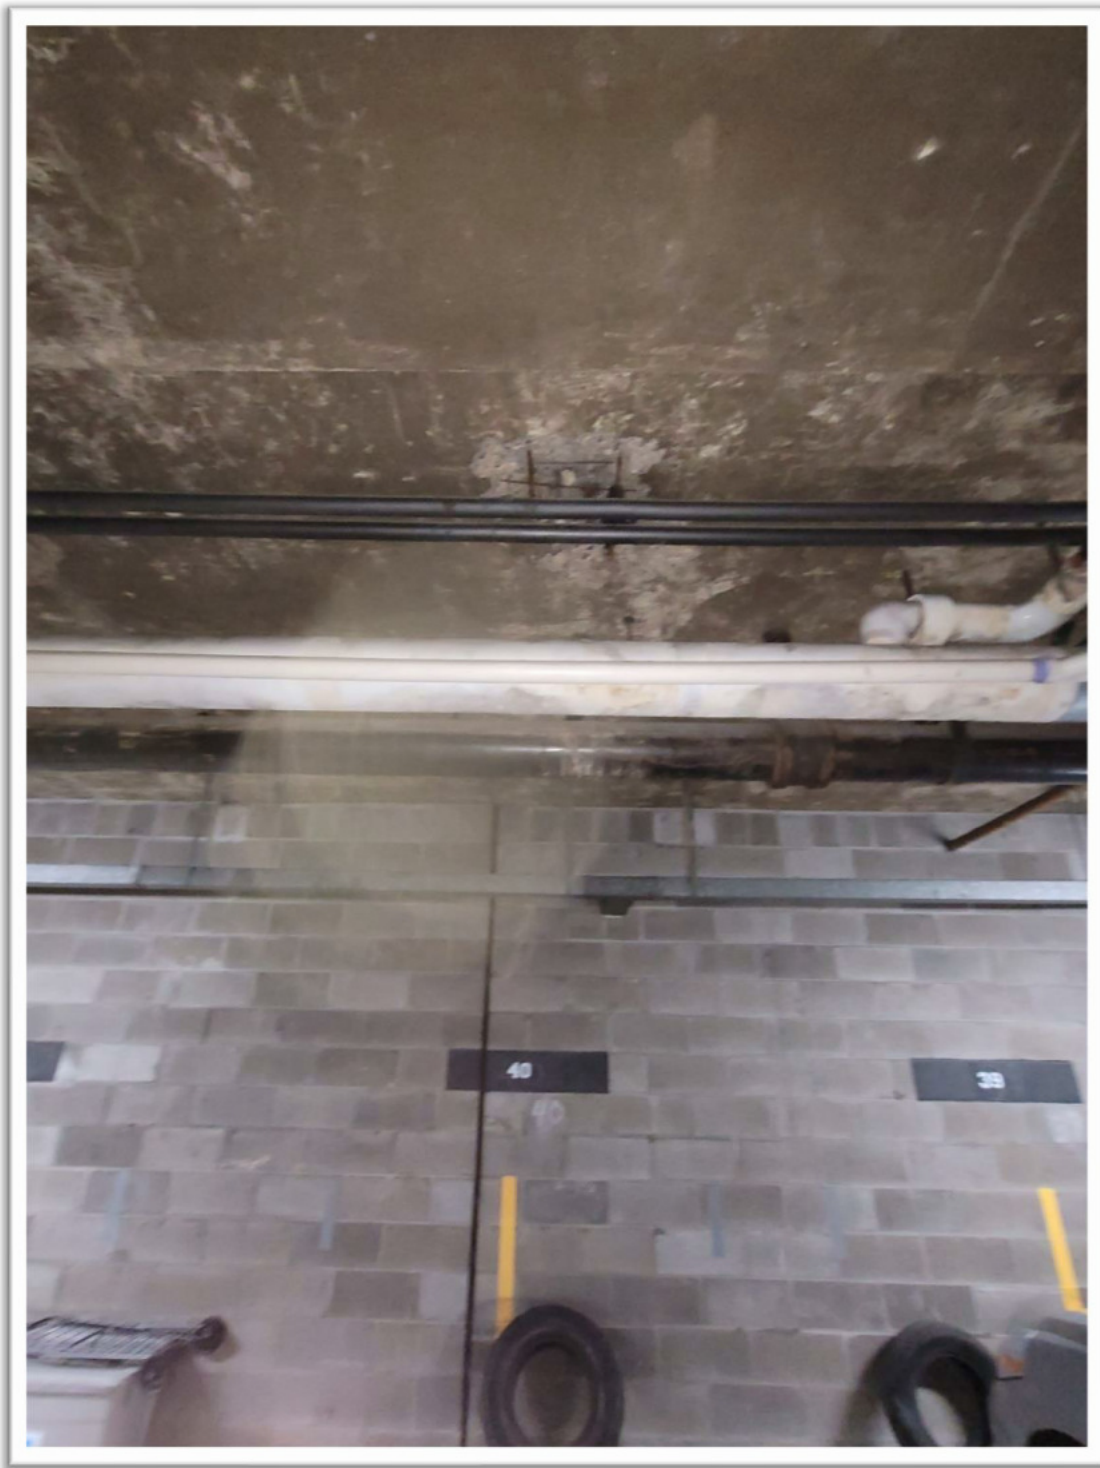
Exposed corroded reinforcement of the ceiling slab.
